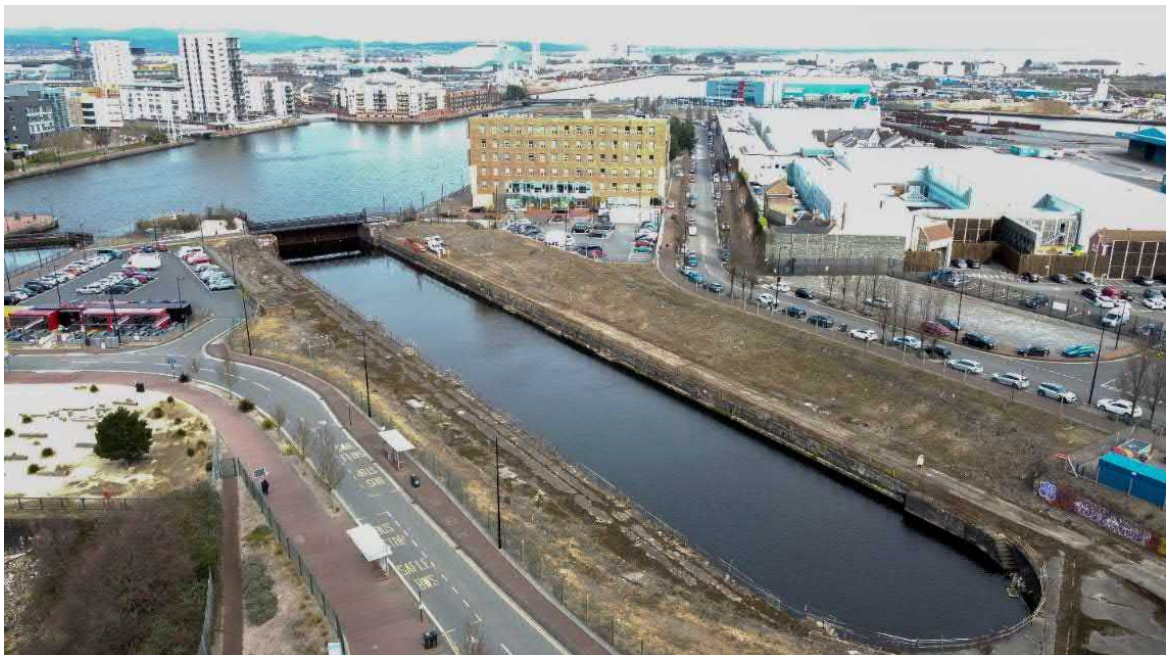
Bute Dry Dock, looking north-east towards Roath Basin.
